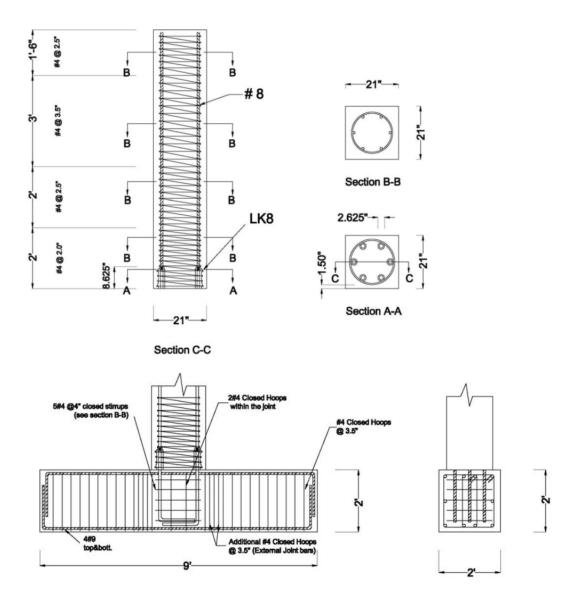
Column and cap beam details for the column to cap beam tests using Lenton Interlock
